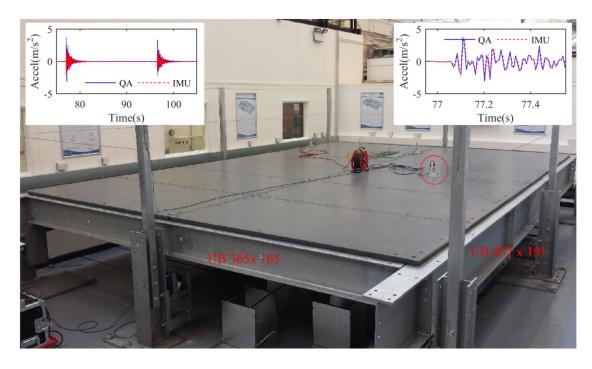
, Test floor structure in the laboratory and accelerometer locations for swipe 6 of the modaltest.
